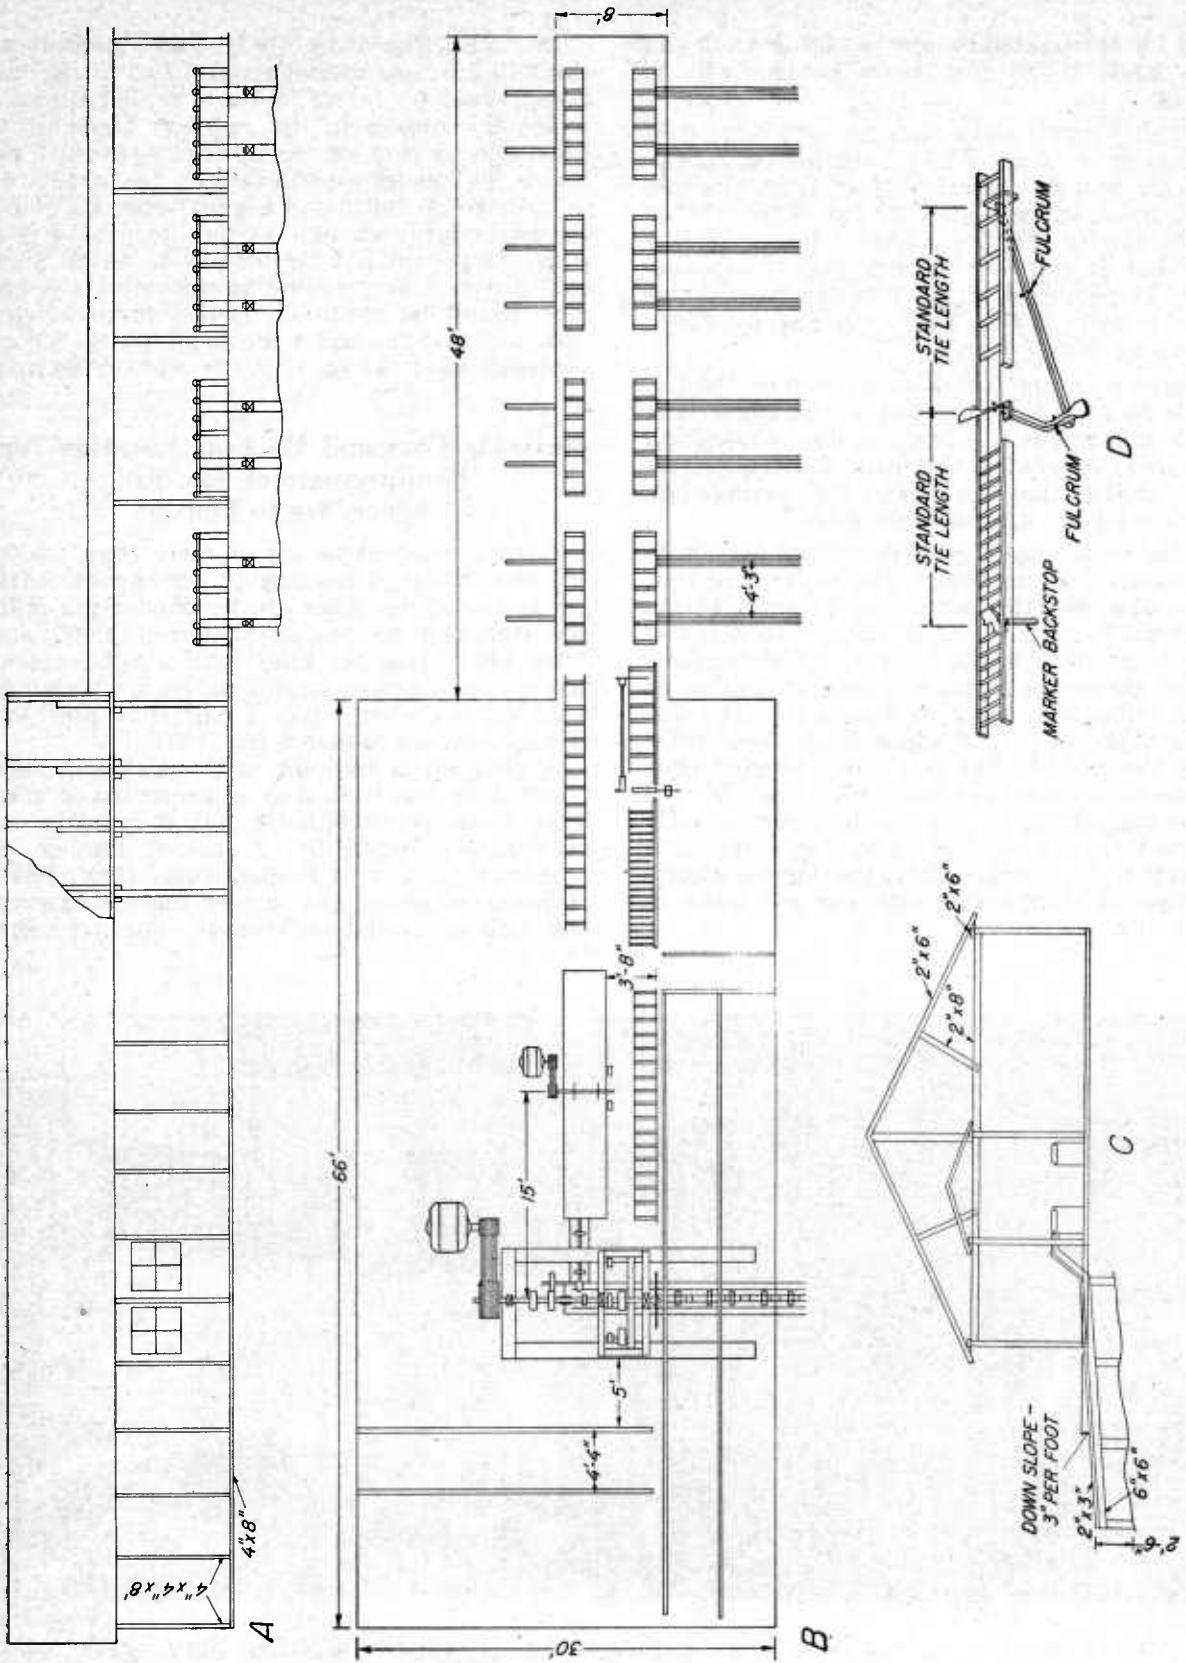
Plan for semipermanent tie mill. A, Side; B, floor plan; C, end; D, device for measuring tie lengths.
